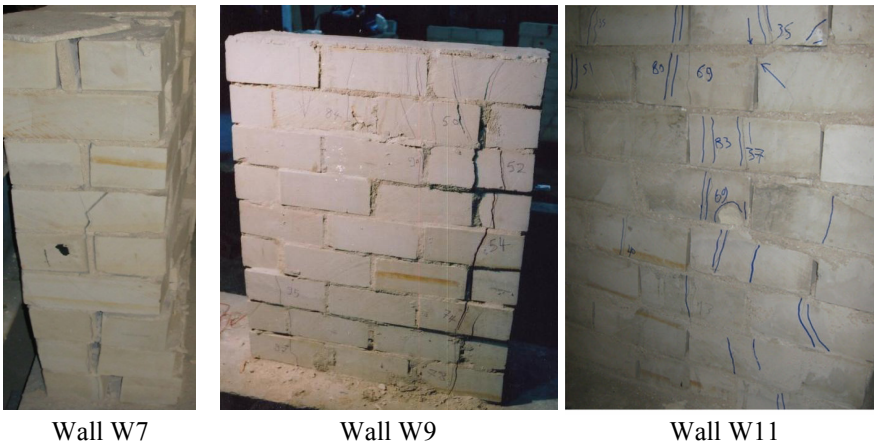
Typical failure of double leaf stone masonry wall specimen.
